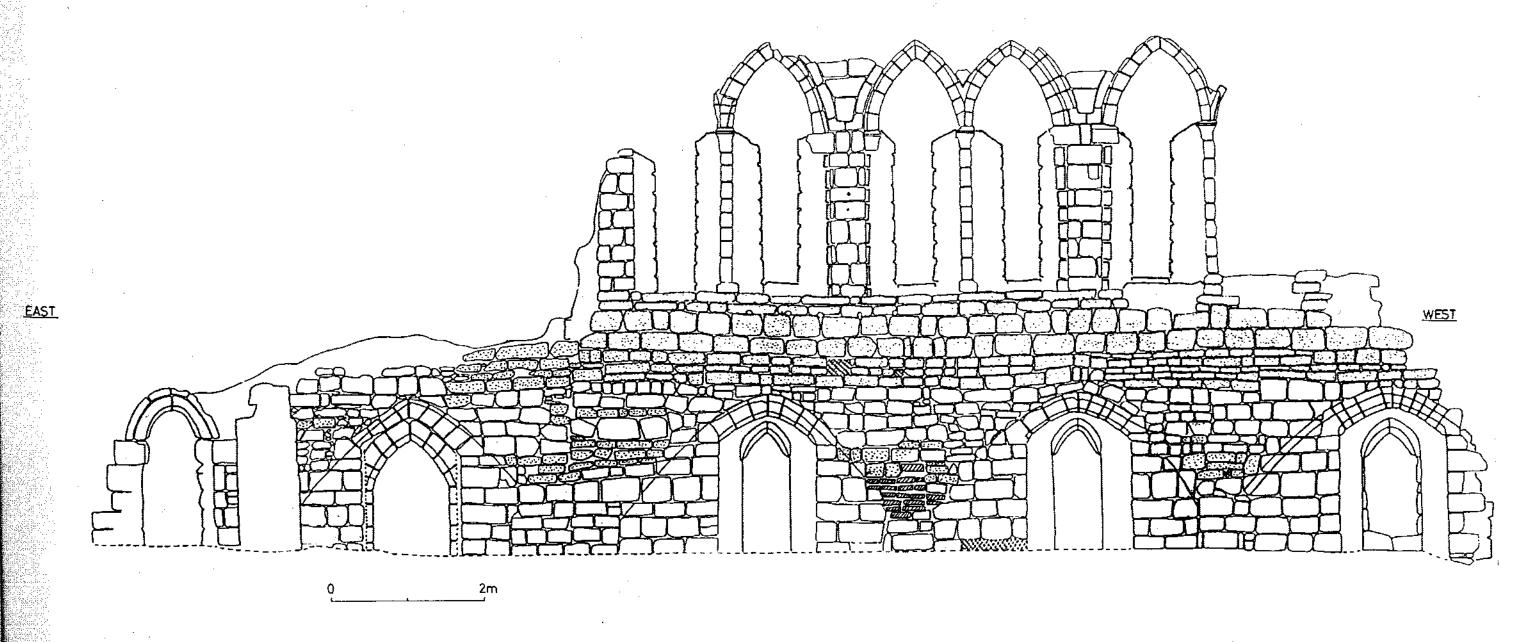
Structure 2. North, Interior Elevation. (Jones/Ferris)
